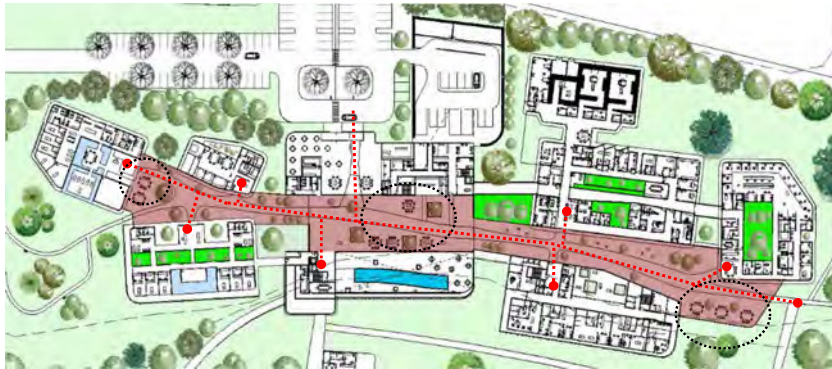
Floor plan highlighting the central spine and wayfinding (Source: by author)
